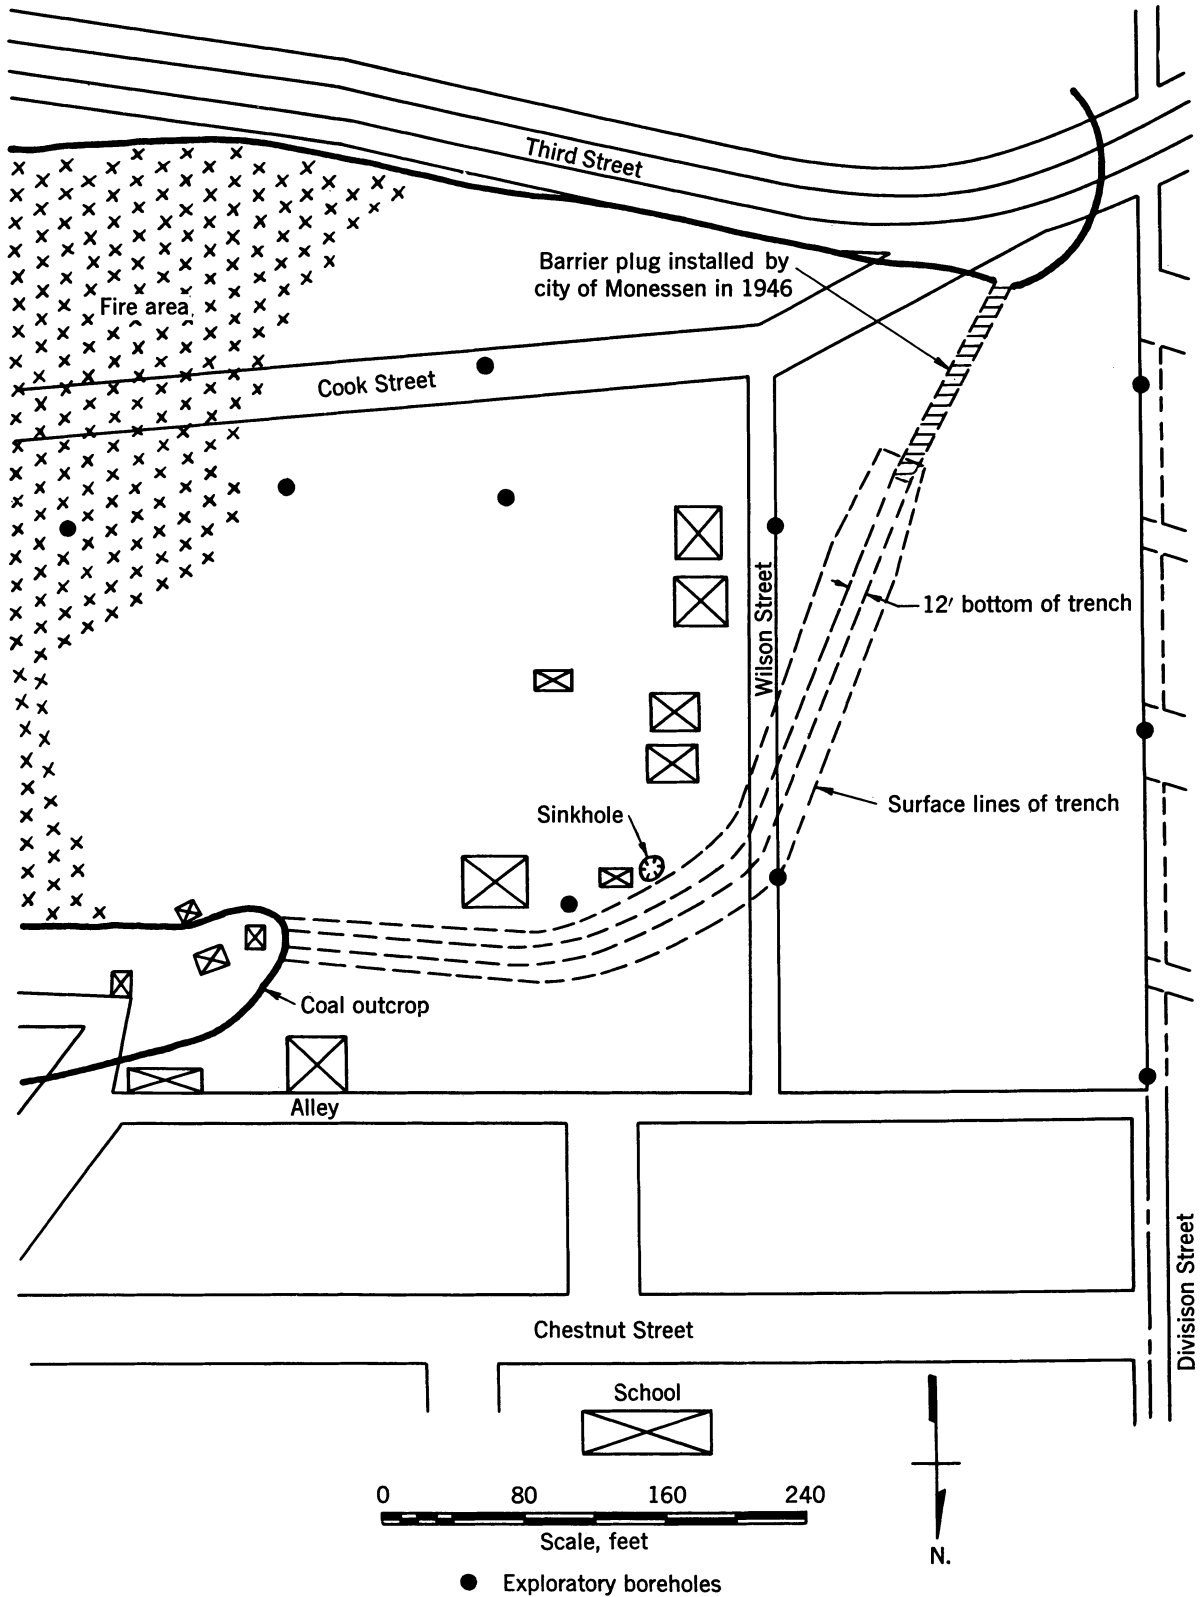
Buildings, Surface Properties, and Location of Trench Made To Isolate Mine Fire Burning in Cook Plan Lots, City of Monessen, Westmoreland County, Pa.
